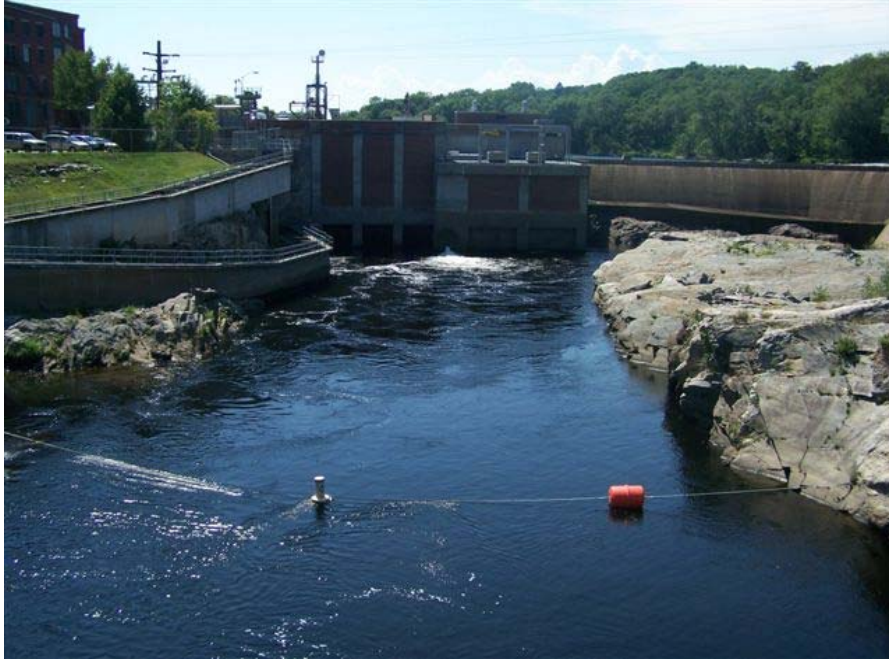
Brunswick Project Tailwater Area (looking toward the north shore)
